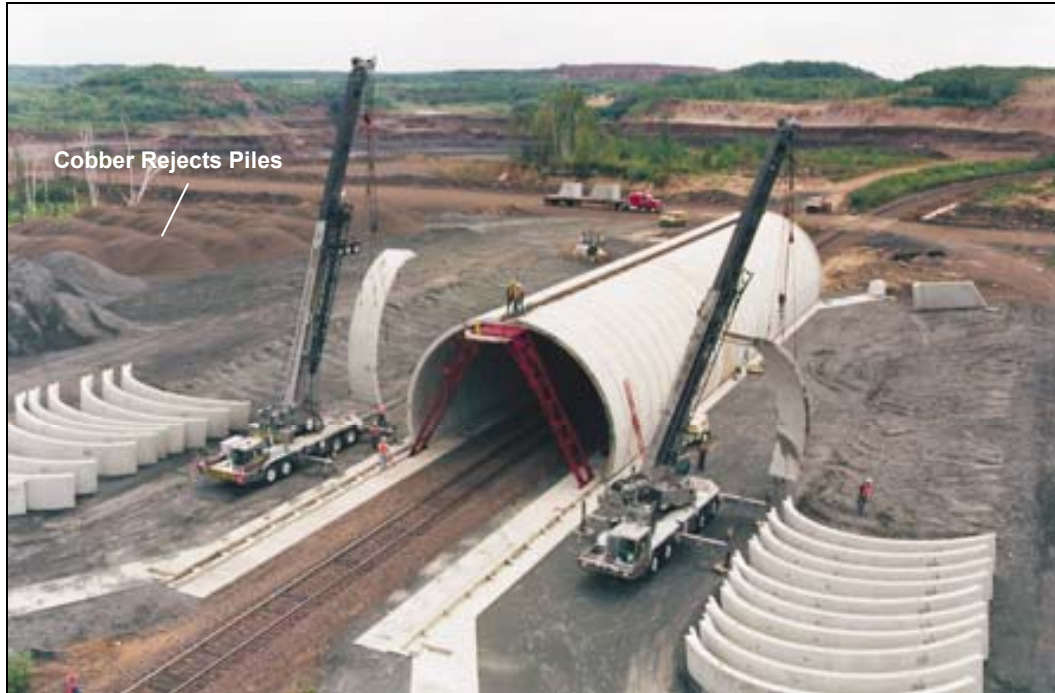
Hibtac railroad arch tunnel - tailings used as base and fill material (photo used with permission, courtesy of Lakehead Constructors).
